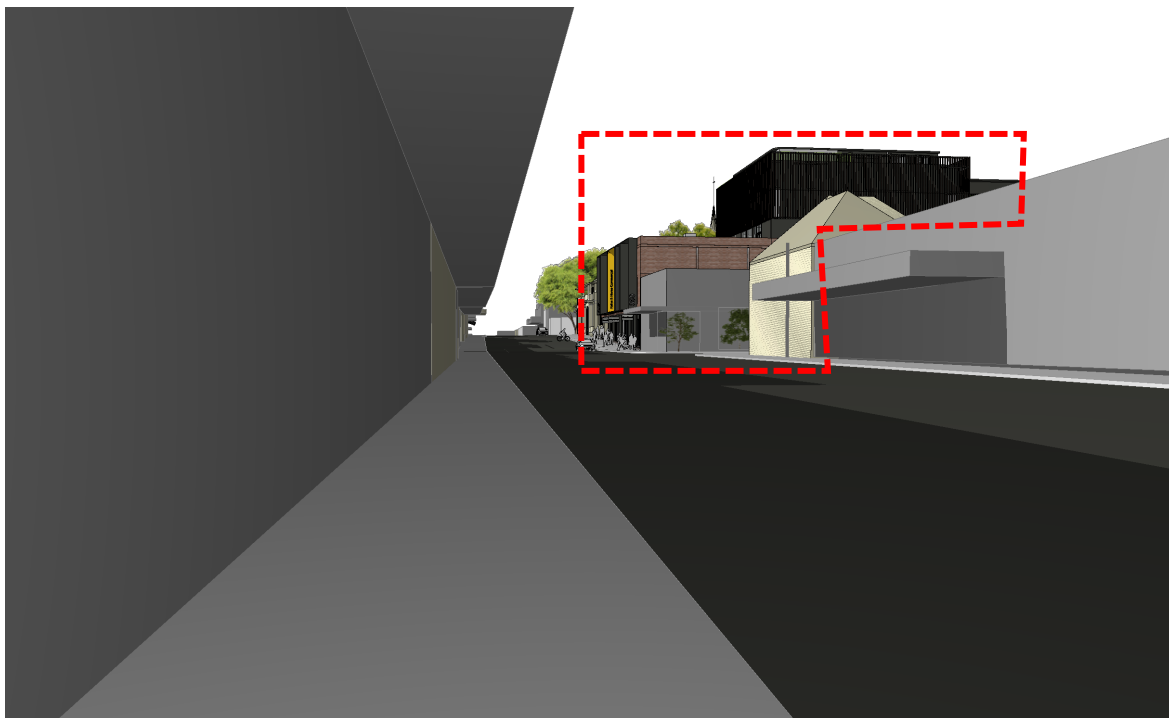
Model of the proposed Building A building in the High Street context. Source: IDG, 'HEN19065_West High Street_B'.
